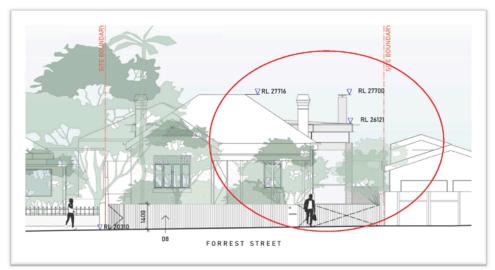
Eastern (Streetscape) Elevation – This extract highlights that the lateral extension will be highly visible from the Forrest Street.
